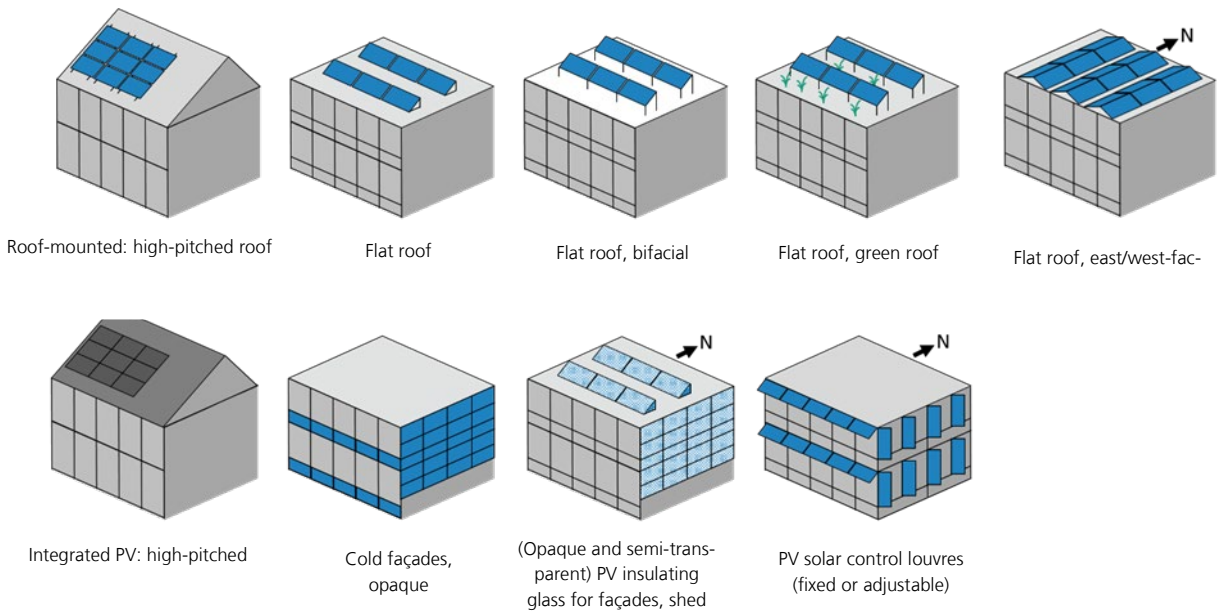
PV solutions for roofs and façades (top row: roof-mounted systems, bottom row: integrated PV).
